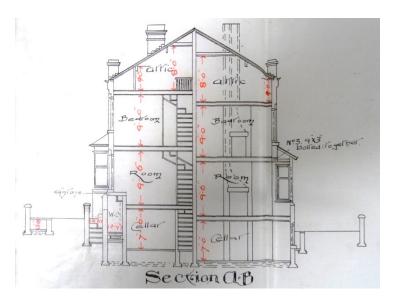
The section shows the staircase, chimney flues, shared WC and garden ash pit (Carby Hall 1893).
